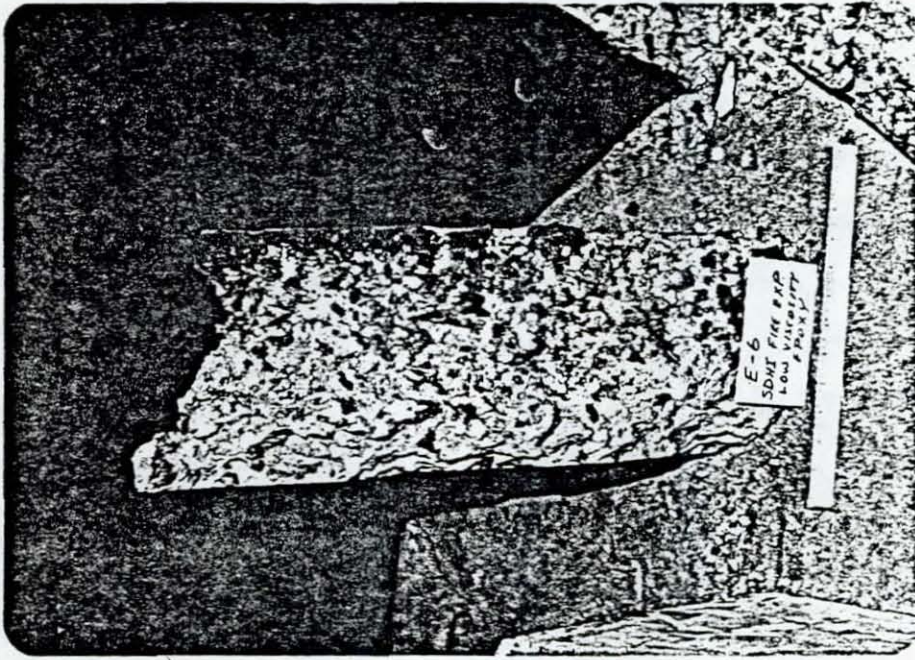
; Failure pattern for 8 in. Thick Specimen. Note the failure through the Concrete.
